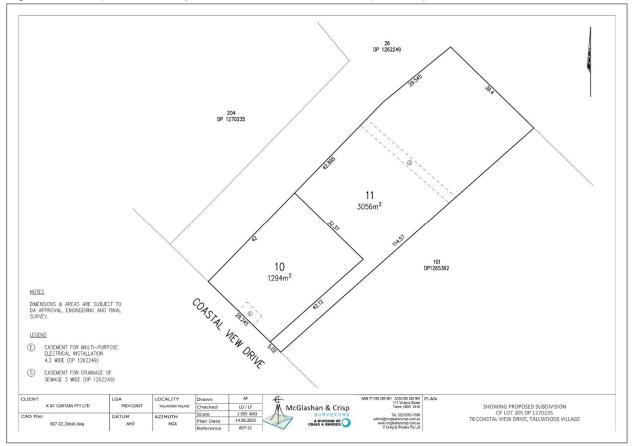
1 – Proposed Plan	(Source: McGlashan	& Crisp 2023)
